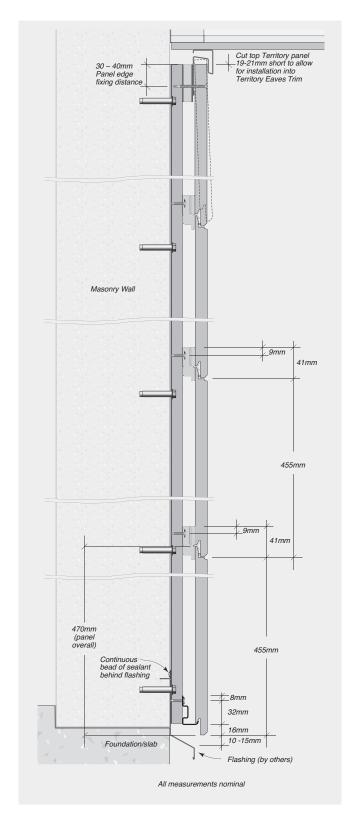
Typical Territory System Cross Sectional Detail for Masonry substrate where face fixing is required – Elevation
